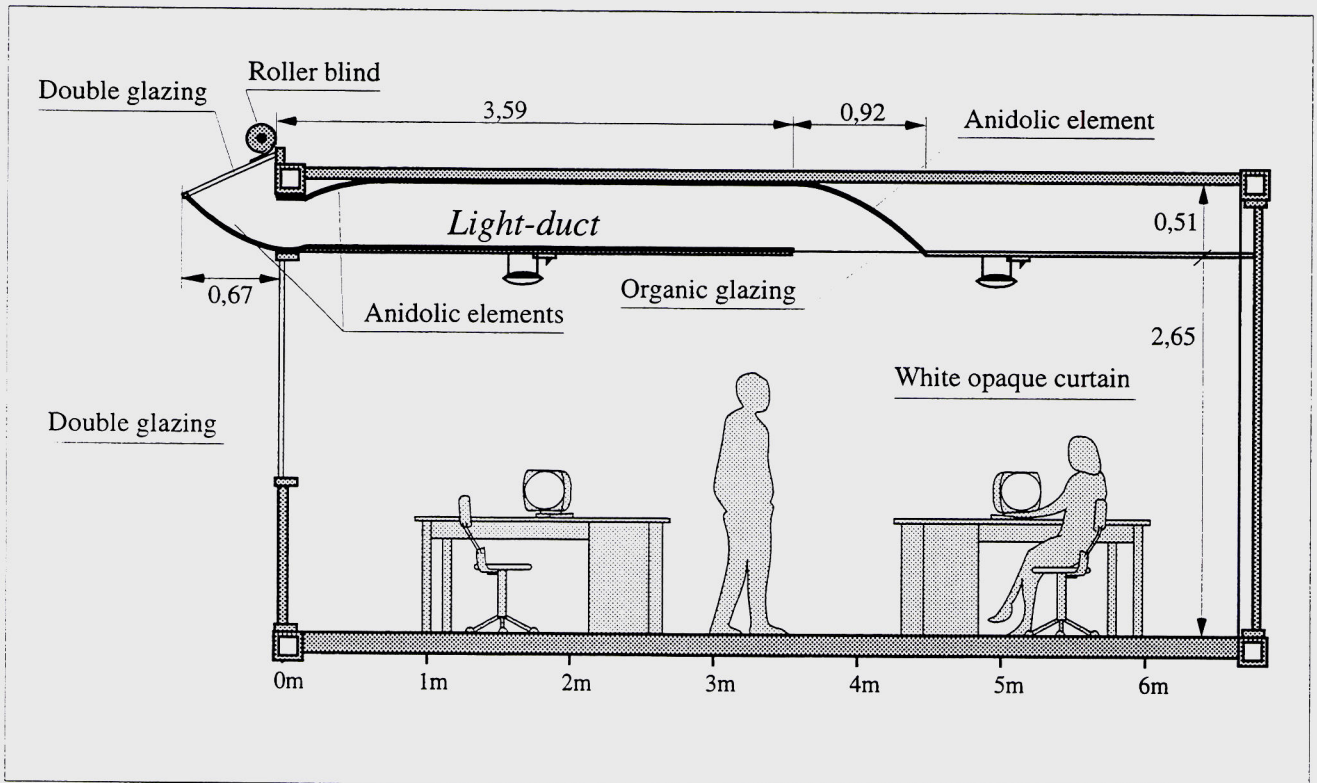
Cross-section of the test room, fitted with an anidolic ceiling
